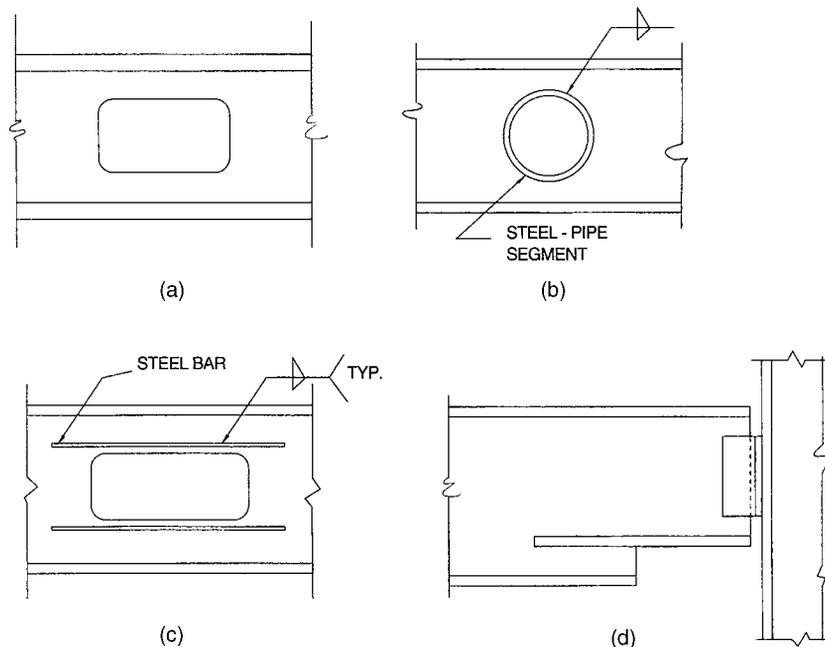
Penetrations for ducts and pipes in beam or girder webs. (a) Rectangular opening, unreinforced. (b) Circular opening reinforced with a steel-pipe segment. (c) Rectangular penetration reinforced with steel bars welded to the web. (d) Reinforced cope at a column.
